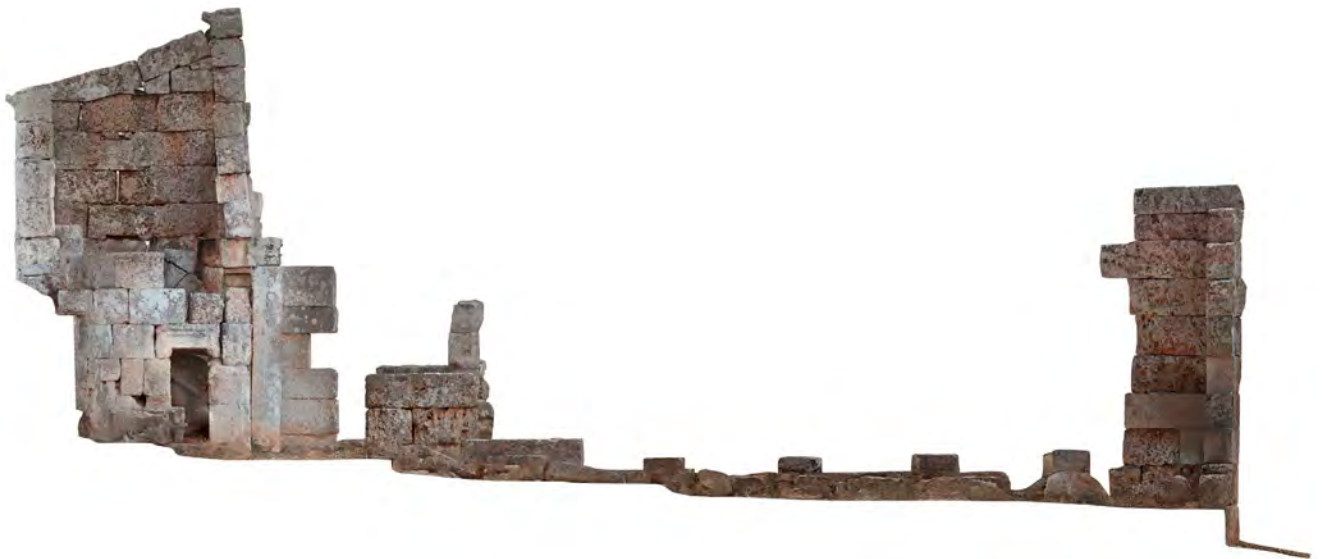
Orthophoto of the side elevation plan (northwest outer wall)
